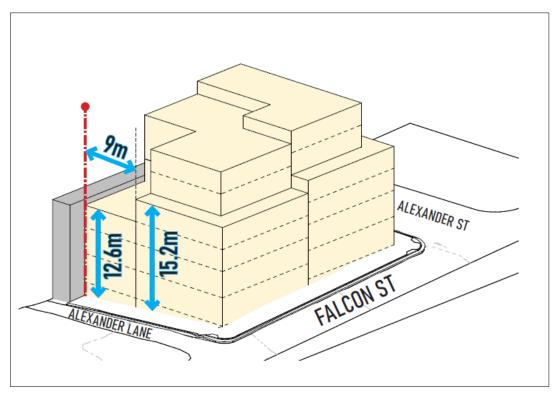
Revised building envelope (Applicant's response to NSLPP recommendations, p. 12)
